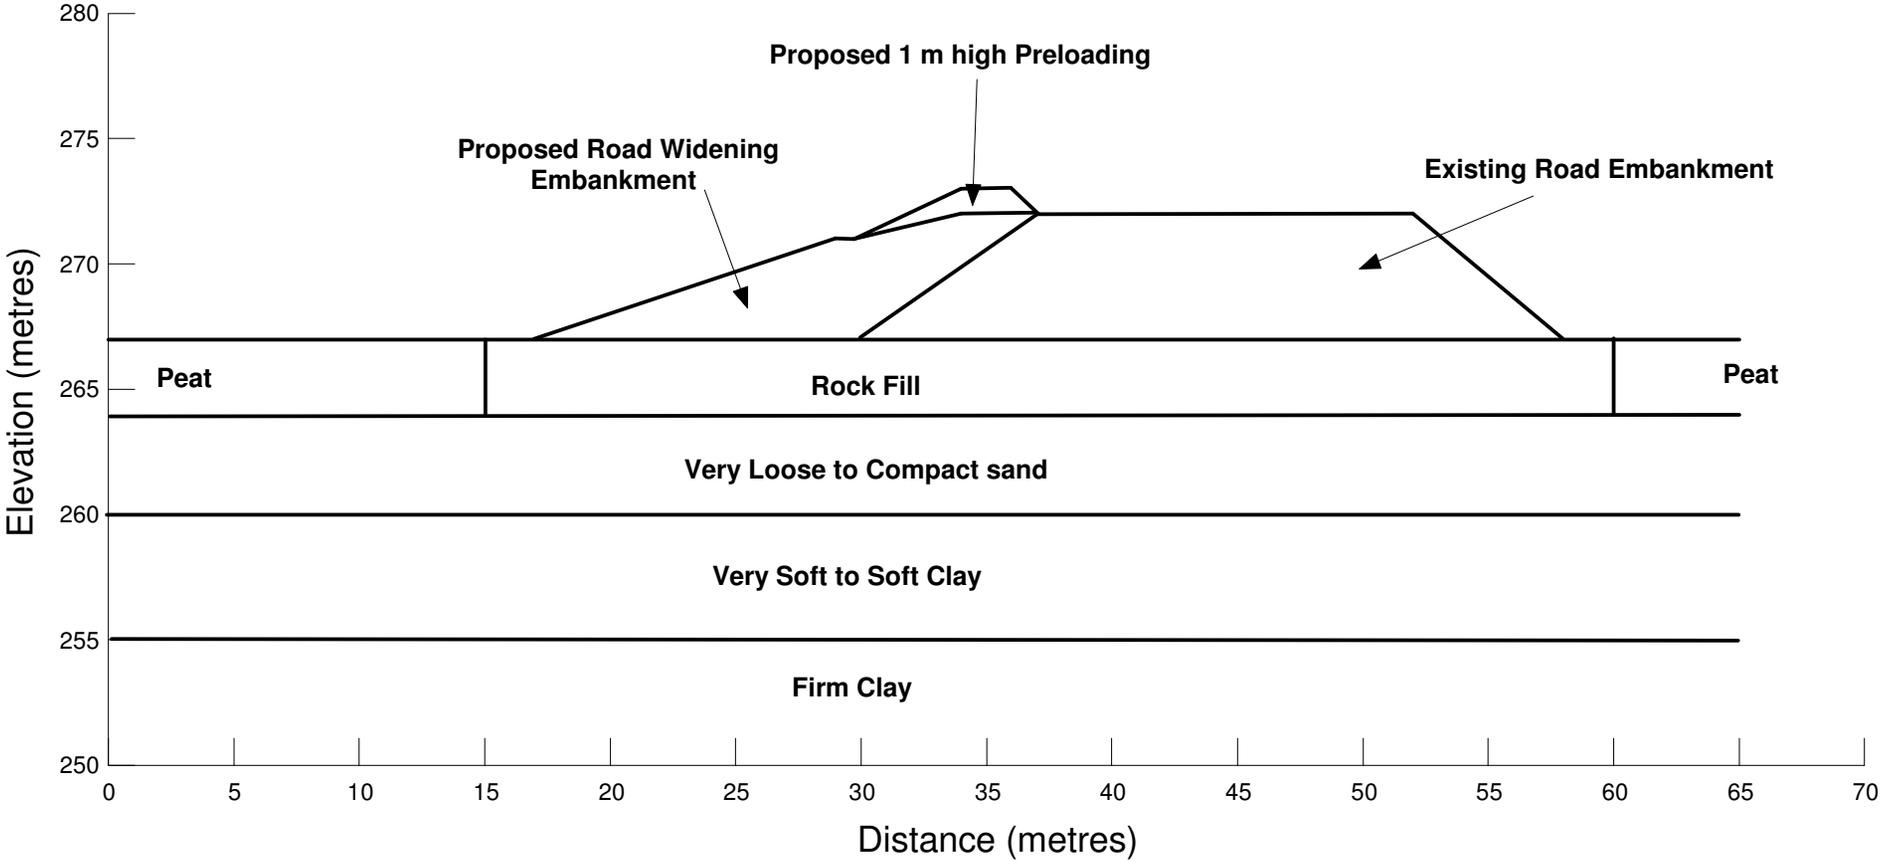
Embankment Configuration and Subsoil Profiles - Road Widening with 1 m Preloading at Station 18+730
